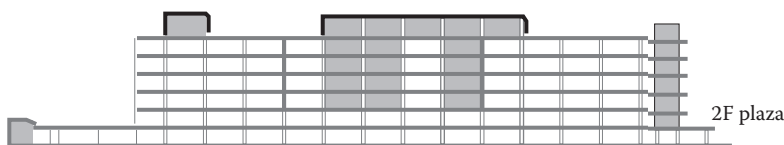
Olive View Hospital, cross section. *Note:* The shear walls stop at first floor. (From FEMA-454, *Designing for Earthquakes: A Manual for Architects*. Washington, DC: Federal Emergency Management Agency, 2006.)
